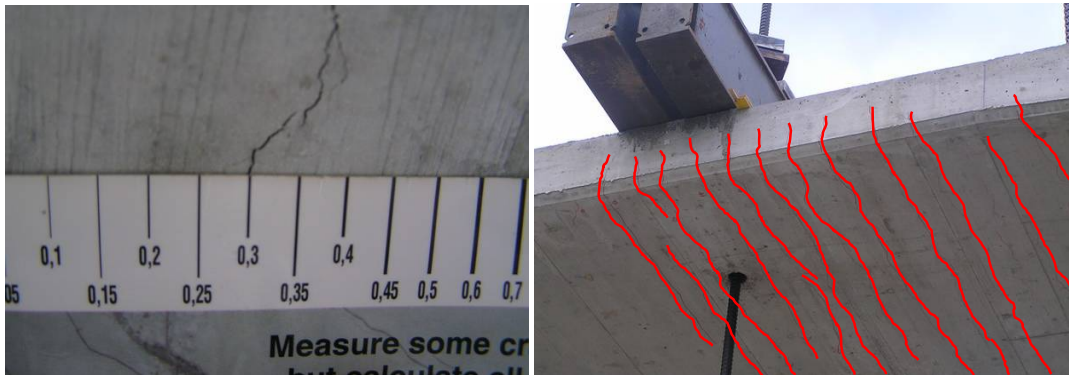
Cracks at the bottom surface of the upper slab – Loading test of „Section 2“
